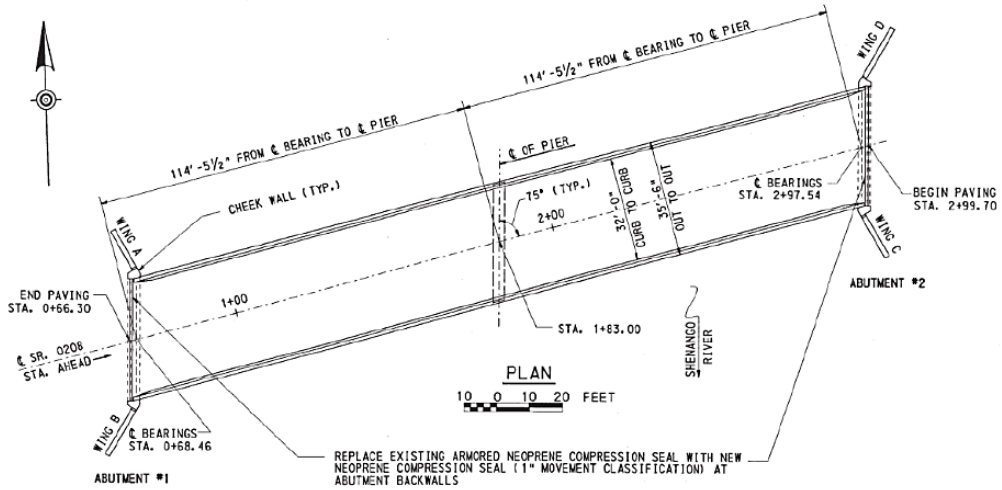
As-Built Plan (Plan View) Bridge No. 22266
